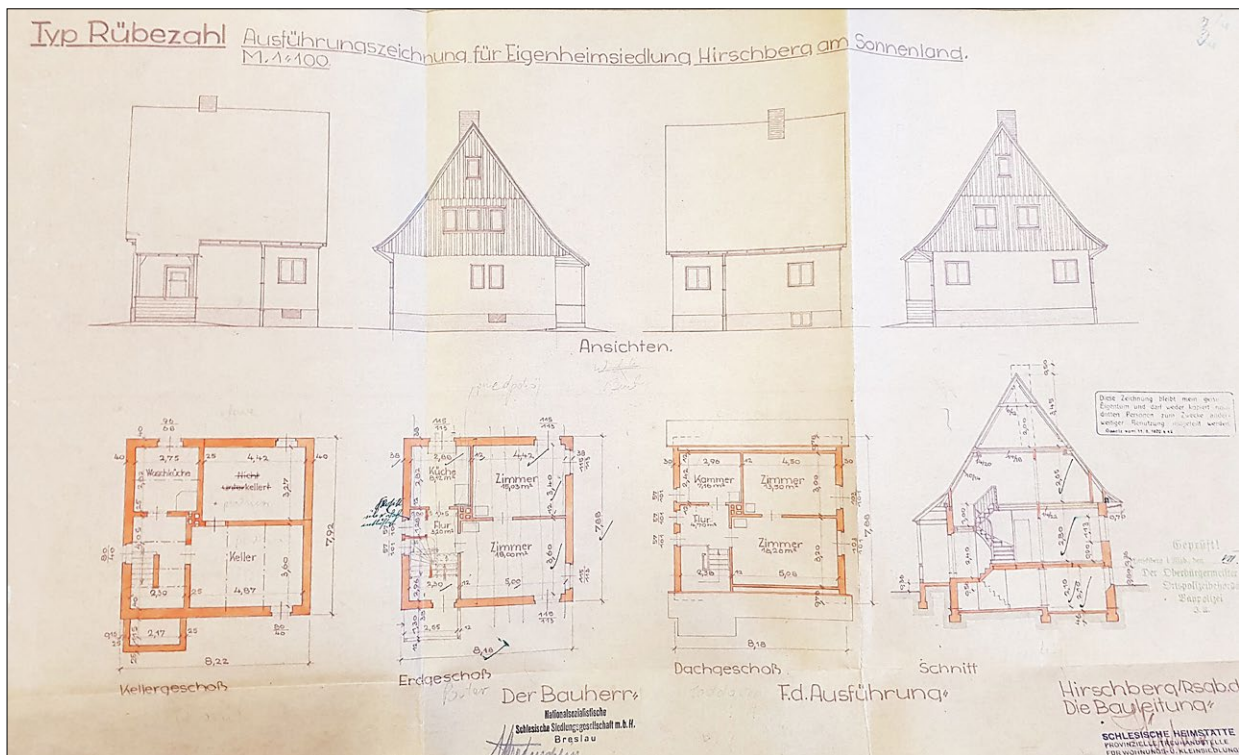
Hans Höpfner, "Rübezahl" house design: facade view, basement, ground floor and attic floor plans, cross-section; source: APW o. JG.
